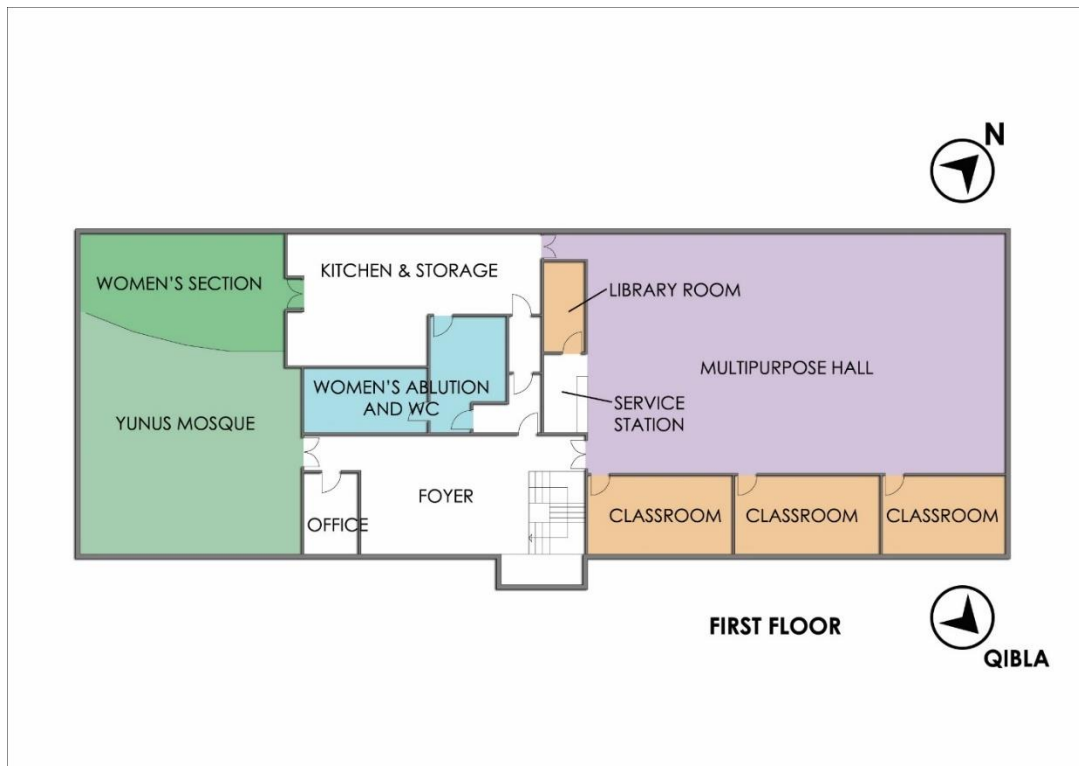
First floor plan of Montreal Turkish Community Center (MTCC).
